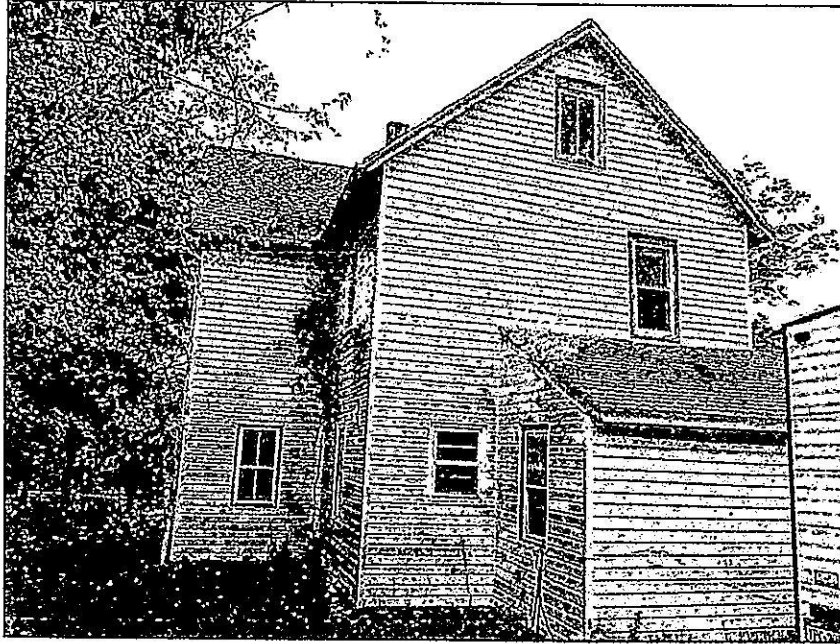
Both rear additions are wood frame with crawl space construction. The Owner removed all of the floor sheathing to exposed the joists and crawl space during SDA's inspection.
